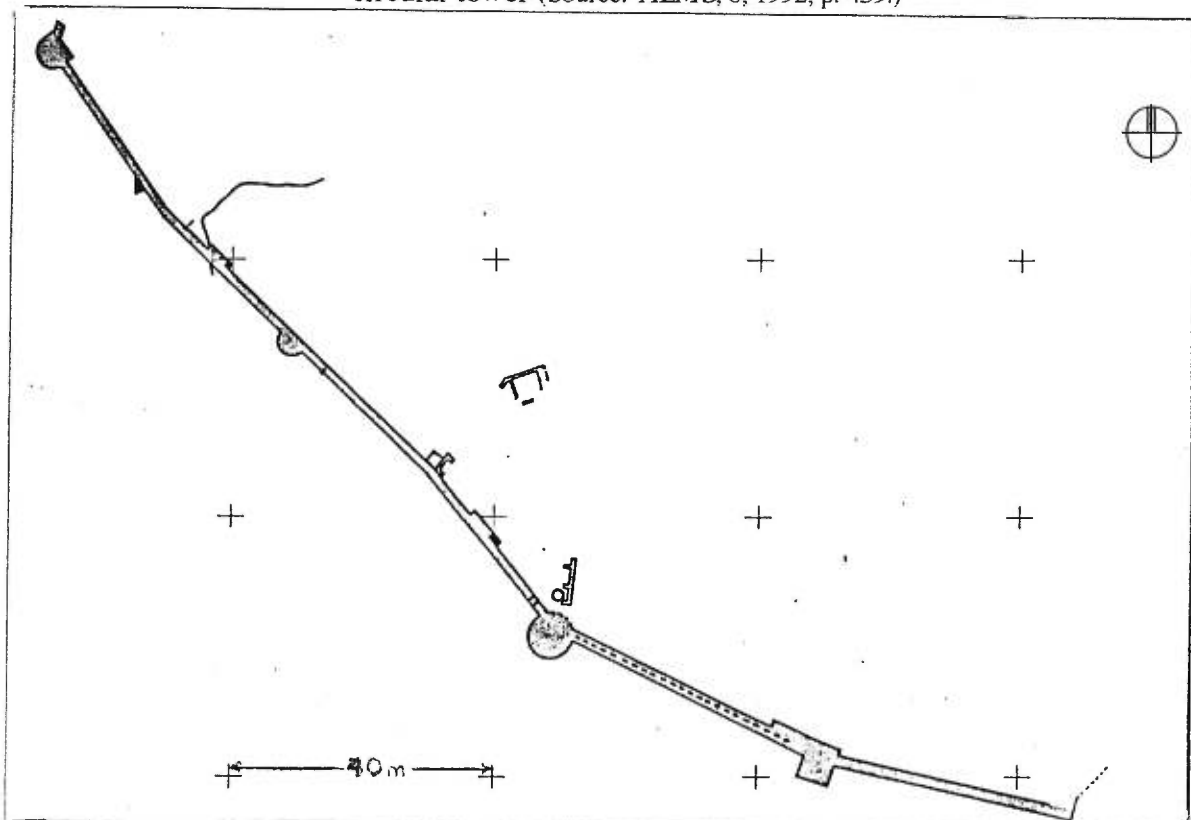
Plan of south Classical wall with towers and water pipe (Source: *AEMQ* 6, 1992, p. 454.)
